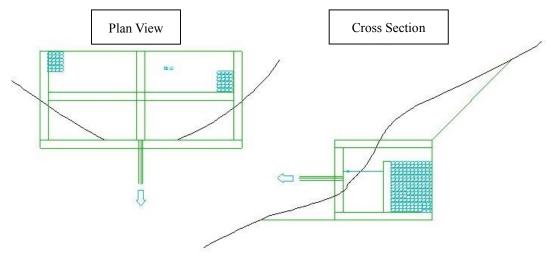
Typical Structure of Intake Facility (Without Existing Intake Facility)
